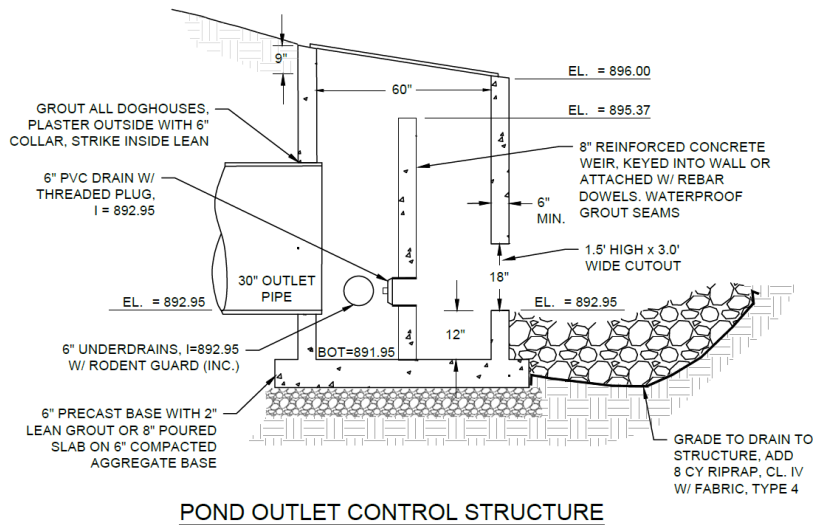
Outlet structure drawing. ‘Treated’ samples collected on left side of structure, near 30” outlet pipe.
